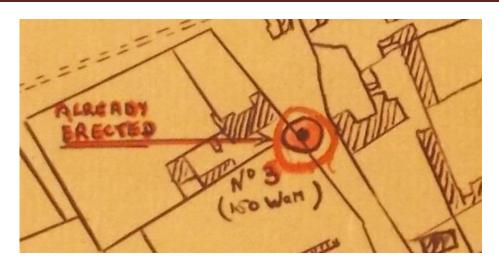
Extract from a plan for public street lighting of 1937 showing the pub (centre) and outbuildings.
